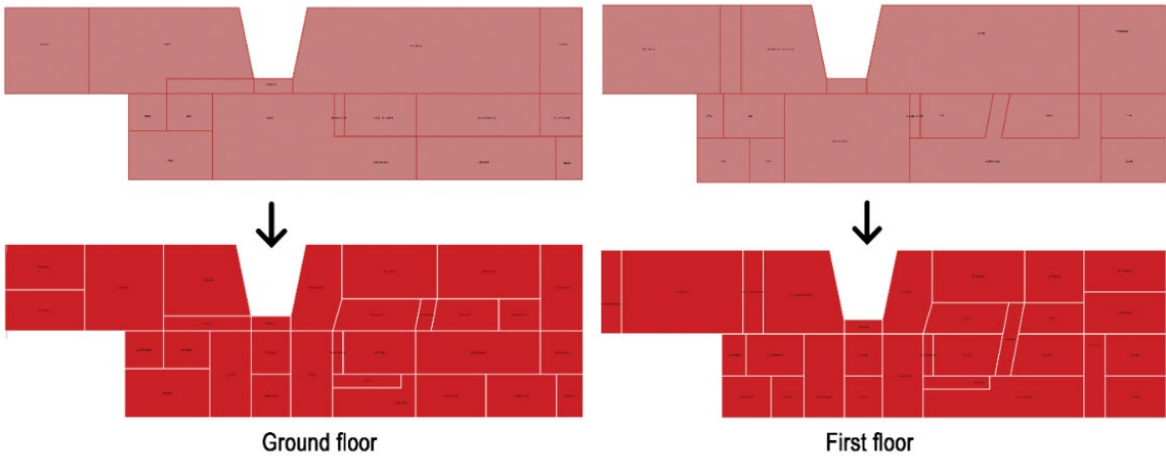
Ground floor and First floor transition from architectural to thermal.
